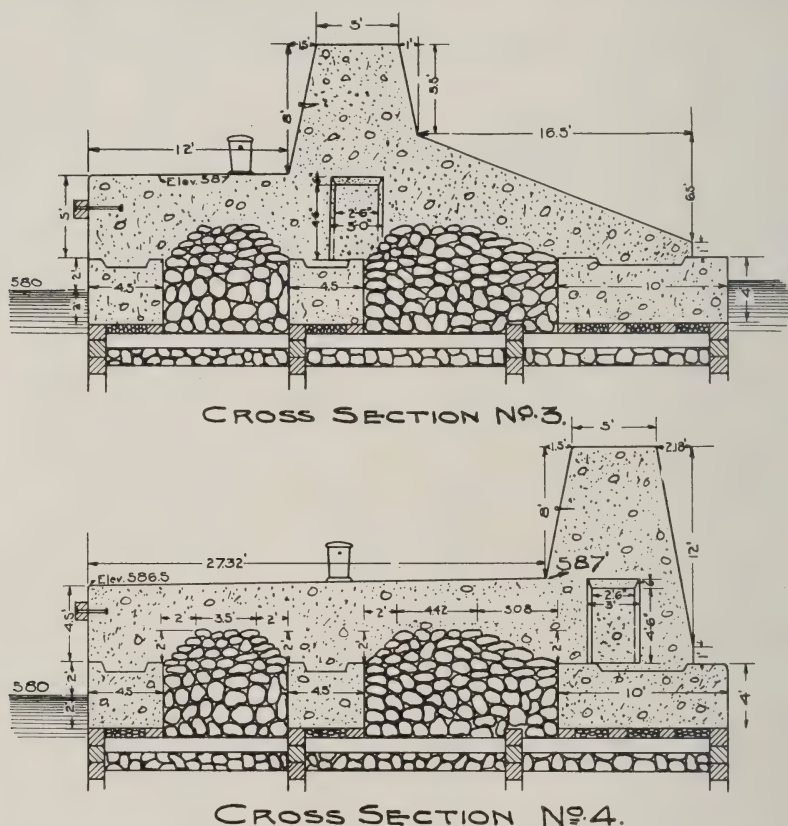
Cross section of Concrete Superstructure of the Main Breakwater, Harbor Beach, Mich., as actually constructed.
